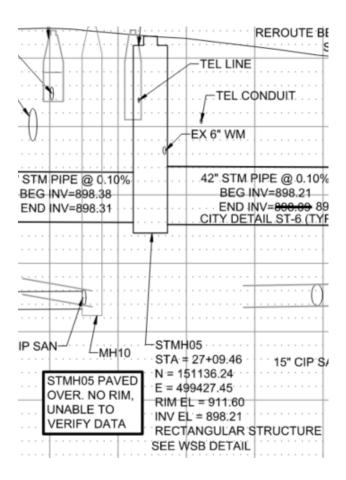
Exhibit E (above) and Exhibit F (right): Record drawings indicate a second diversion structure at the intersection of Lake Street and Blake Road. According to the drawings, this diversion is paved over and additional detail is missing from surveys, plans, and studies, to confirm the existence or mechanics of a storm sewer diversion in this area. There are no storm sewer pipes shown draining in any directions different from the main storm sewer line.
